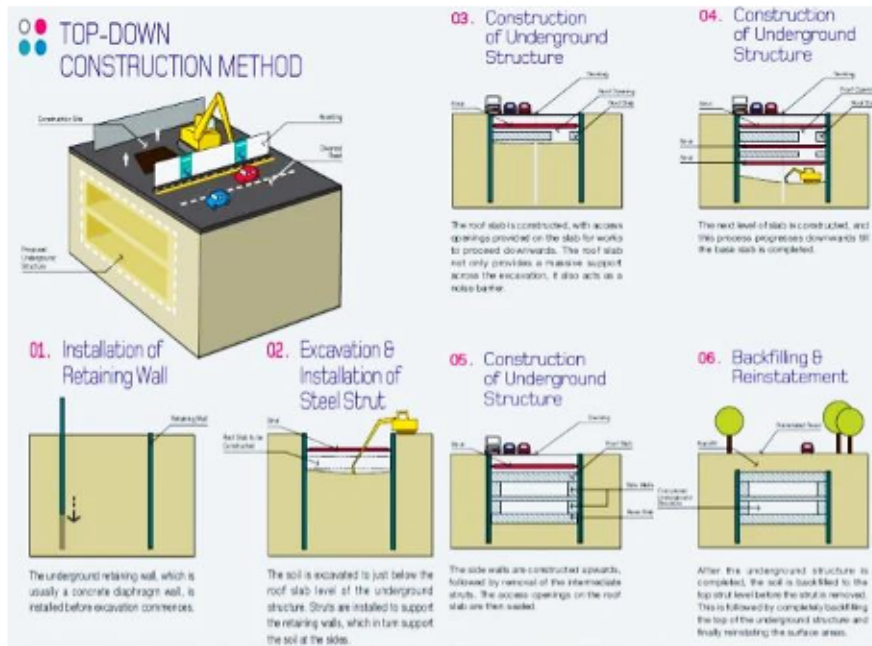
Typical “Top-Down” Construction for River Approach Tunnels
